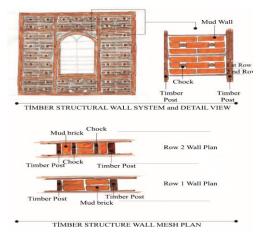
Oriel or cantilever wall construction with timber frame and its drawing details. The inventory number of the traditional house is 144.
